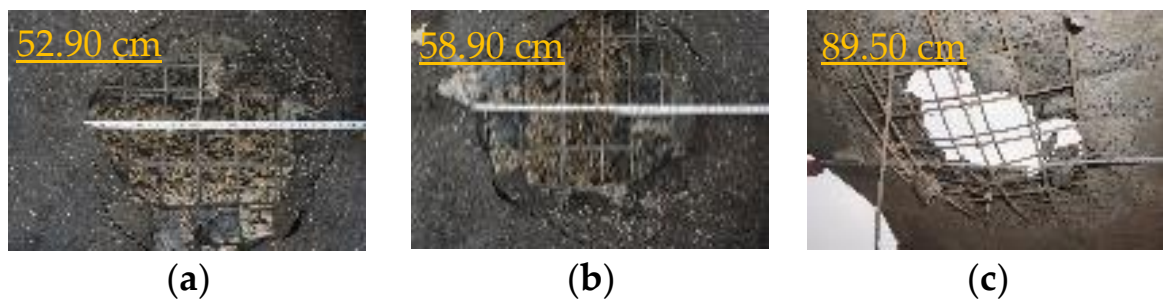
Dimensions of the hole of mid-chamber (PPCG). (a) Dimensions of the hole of the top surface (longitudinal direction). (b) Dimensions of the hole of the top surface (transverse direction). (c) Dimensions of the hole of the bottom surface (transverse direction).
